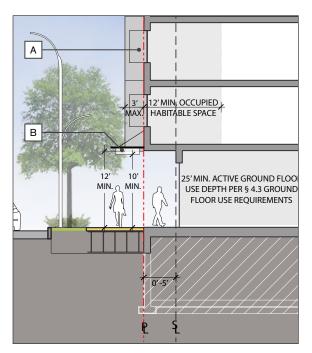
0'-5' SETBACK - RECESSED GROUND FLOOR
